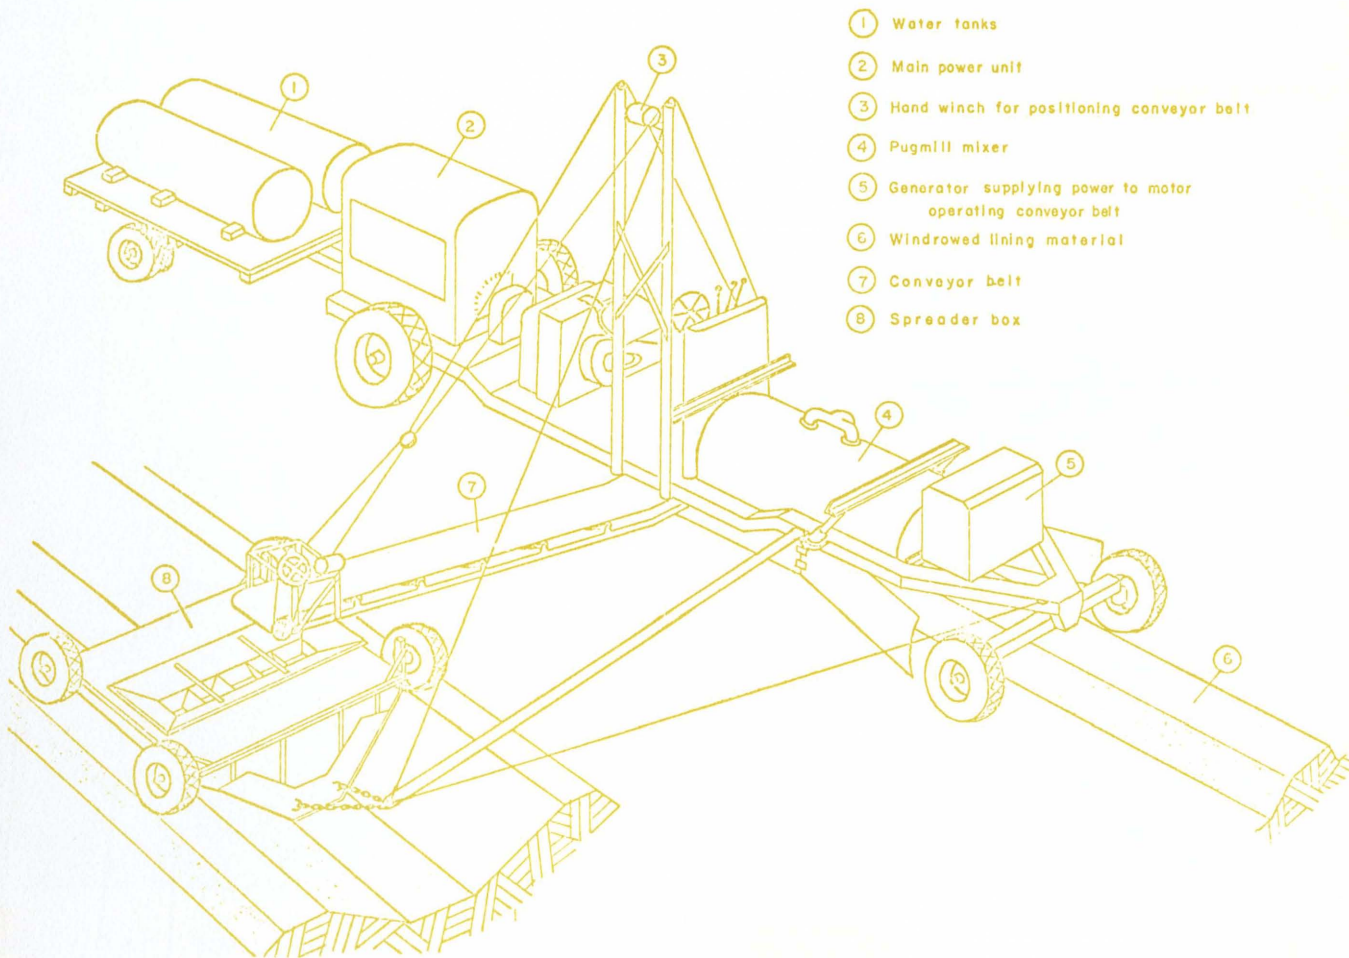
Perspective view of mixing equipment used in soil-cement ditch lining tests.
